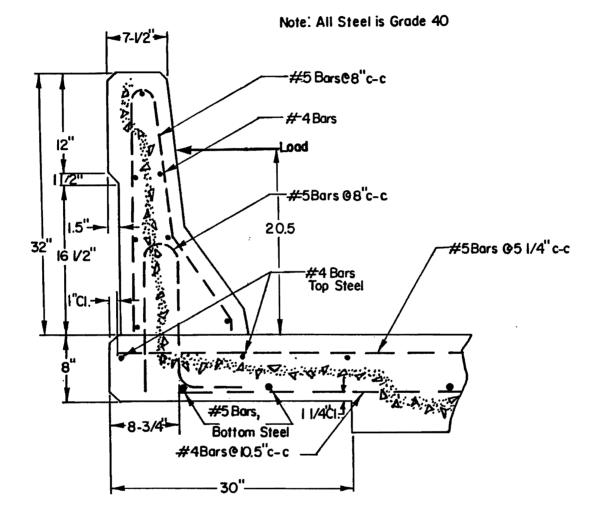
Standard Texas Type T5 Concrete Bridge Rail and Deck.
